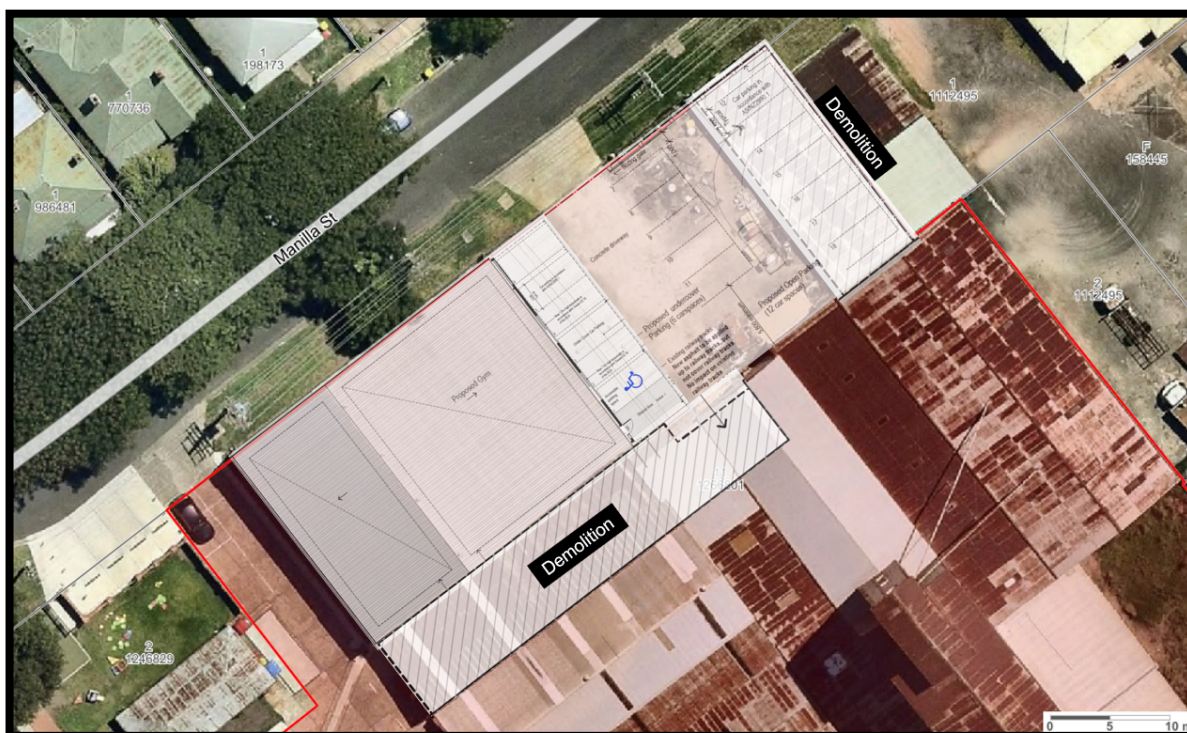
Site Plan Overlaid on Aerial Mapping – Demolition of Two (2) Structures, Change of Use of Shed to Recreation Facility (Indoor), Construction of New Eighteen (18) Space Carpark – North-Western Side of Lot 11 DP 1266801 – Tremains Mill Precinct
